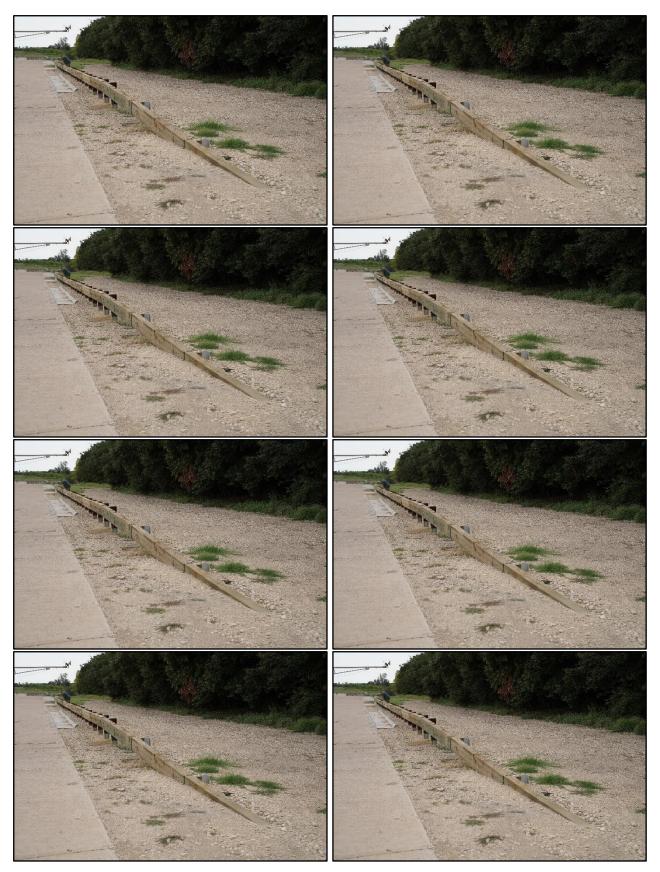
Modified Merritt Parkway Guiderail with No Curb prior to Testing.
